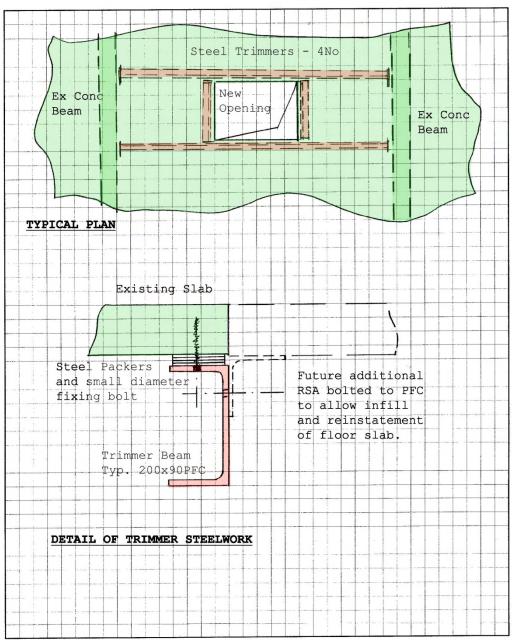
Proposed Trimming Detail – Plan and Trimmer Detail
